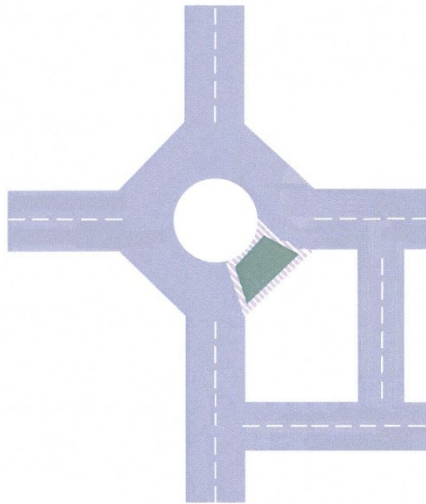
Work Zone Completely Obstructing the Circulatory Area of a Roundabout
